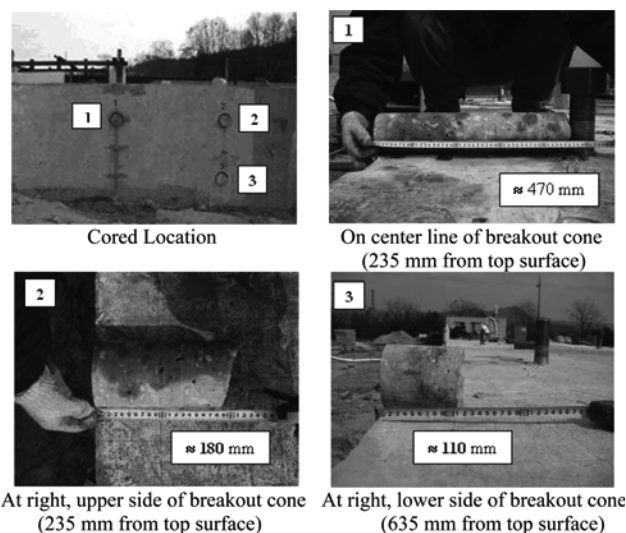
Internal crack profile in Specimen S1. (Note: 1 mm = 0.0394 in.)
